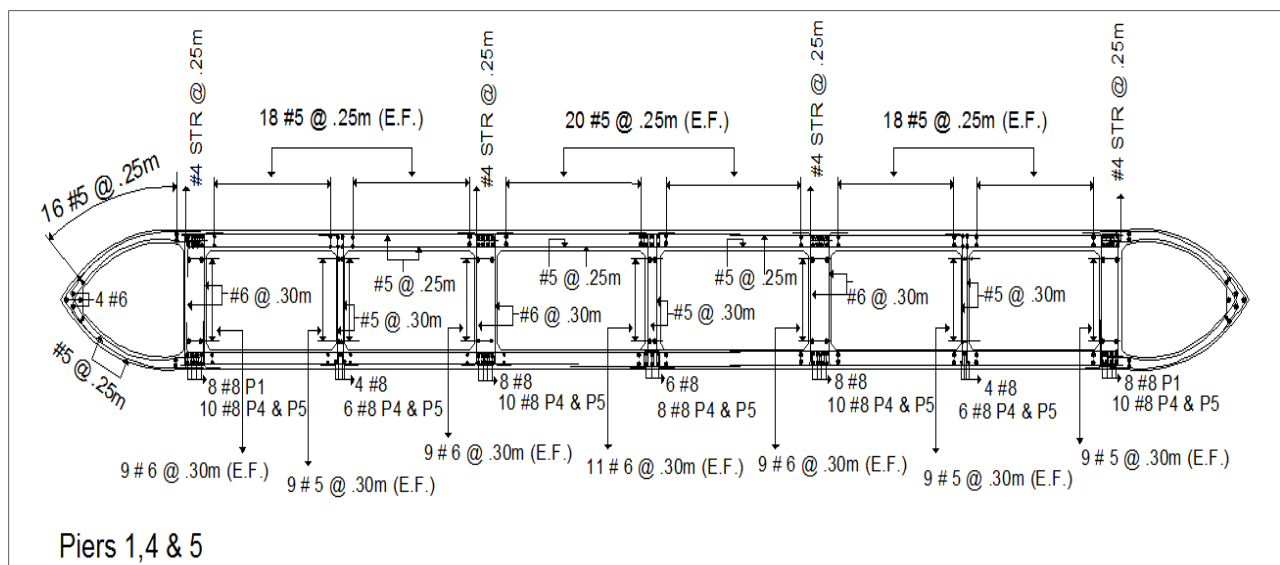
11. Reinforcement details for piers 1, 4, and 5.
